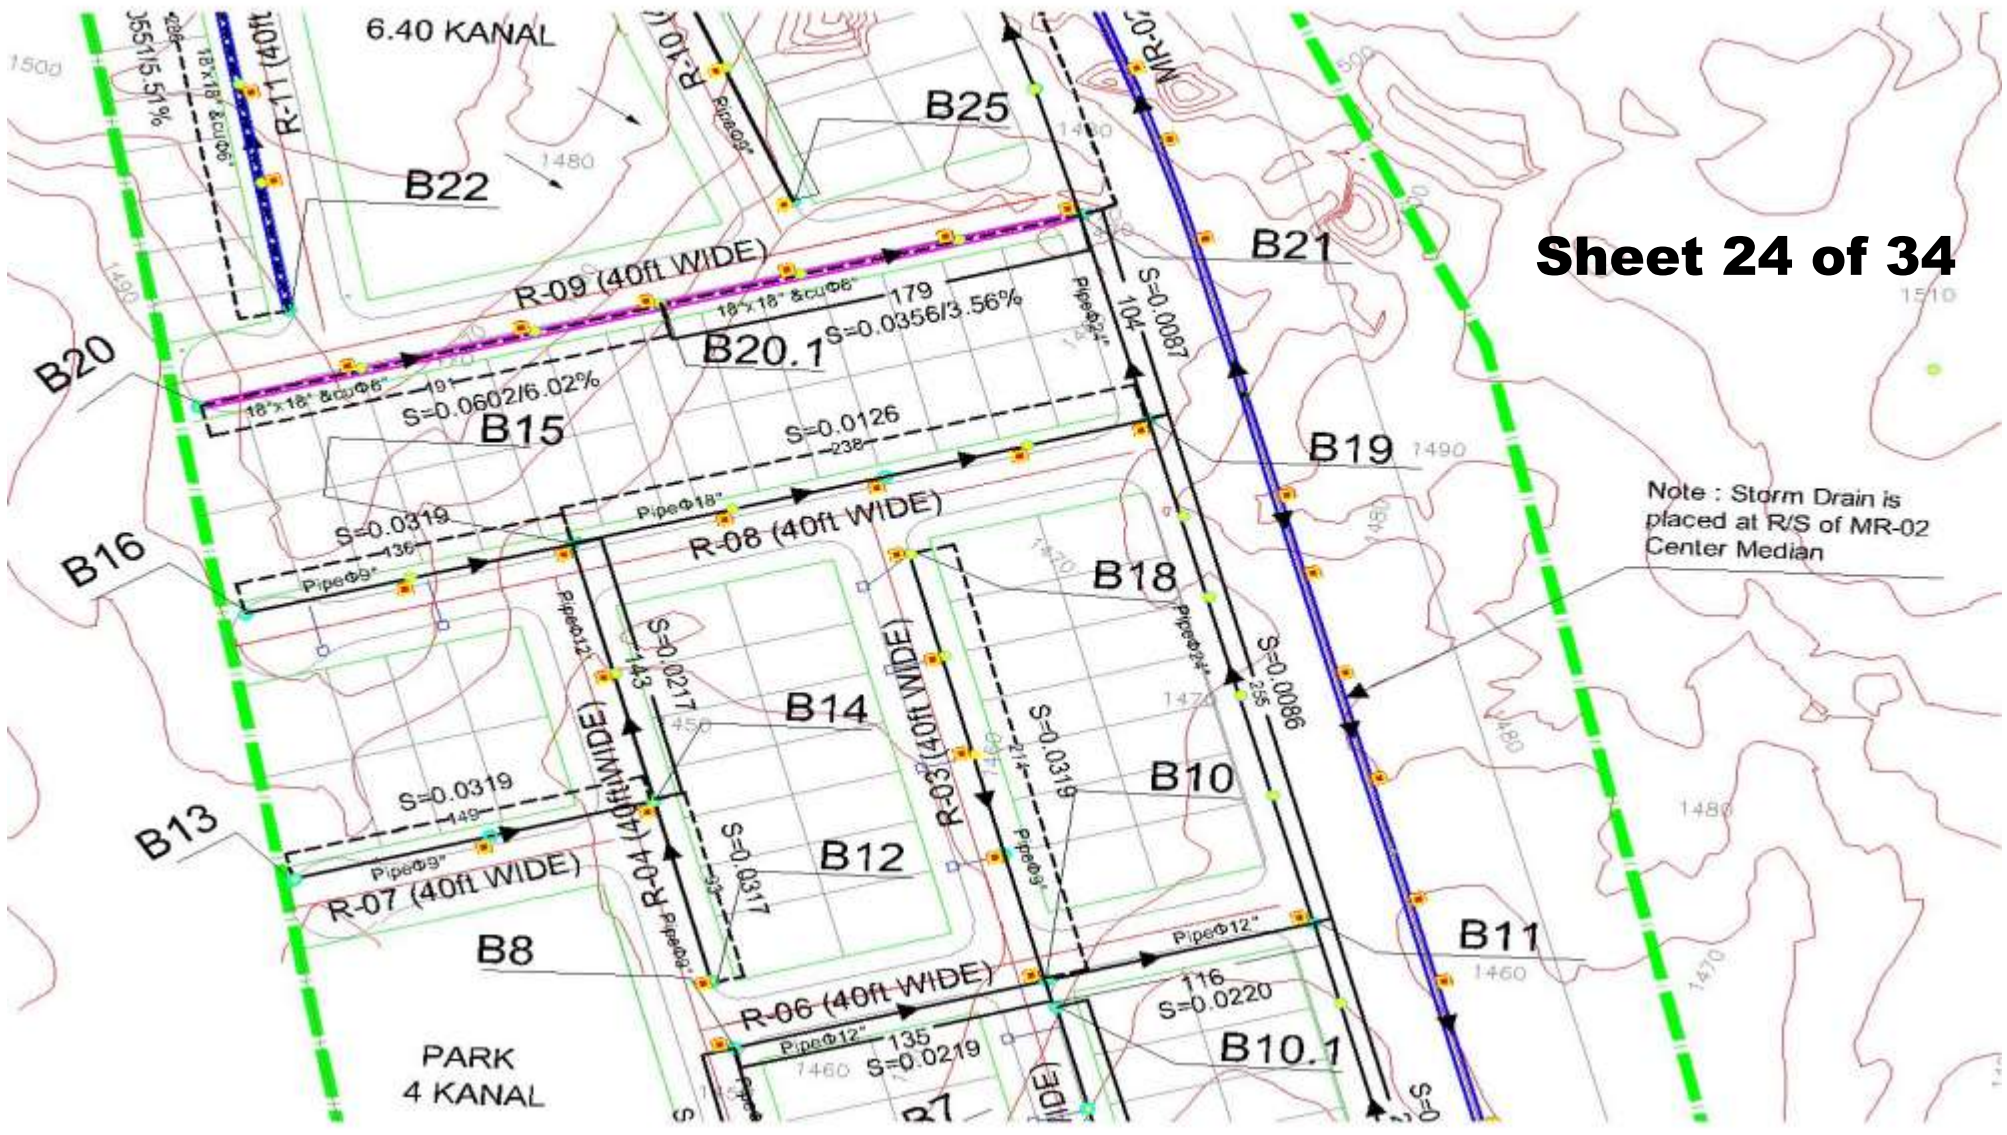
Layout plan of Zone-2 beside MR-02 showing initial node B1
